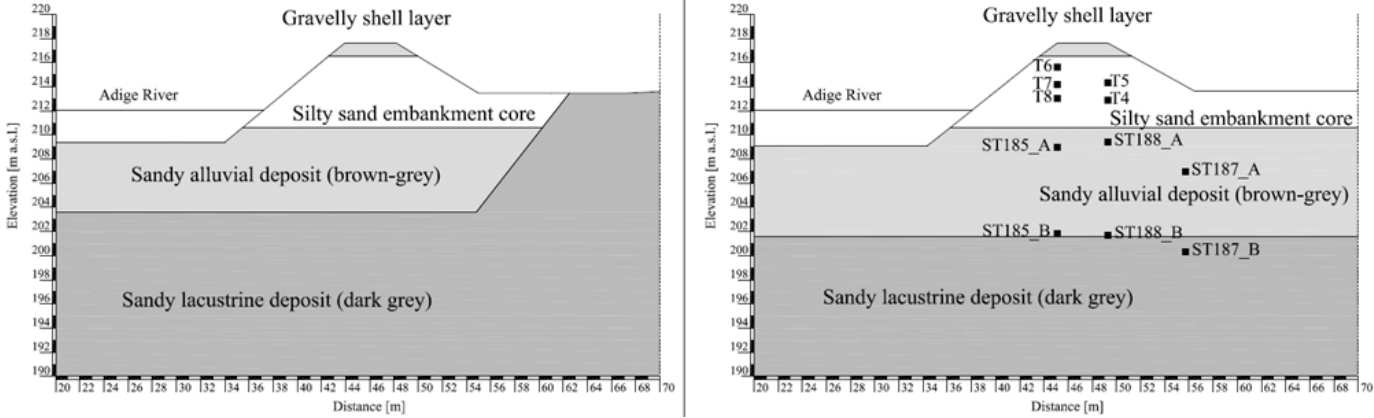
Soil profile for the section within (left) and outside (right) the failure segment.
